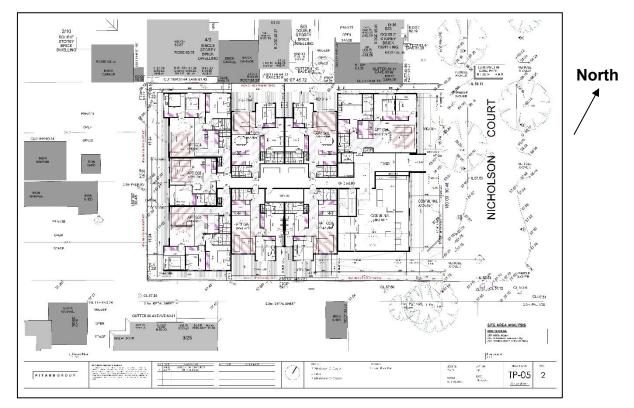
Ground level plan of the proposed 7-9 Nicholson Court Development
